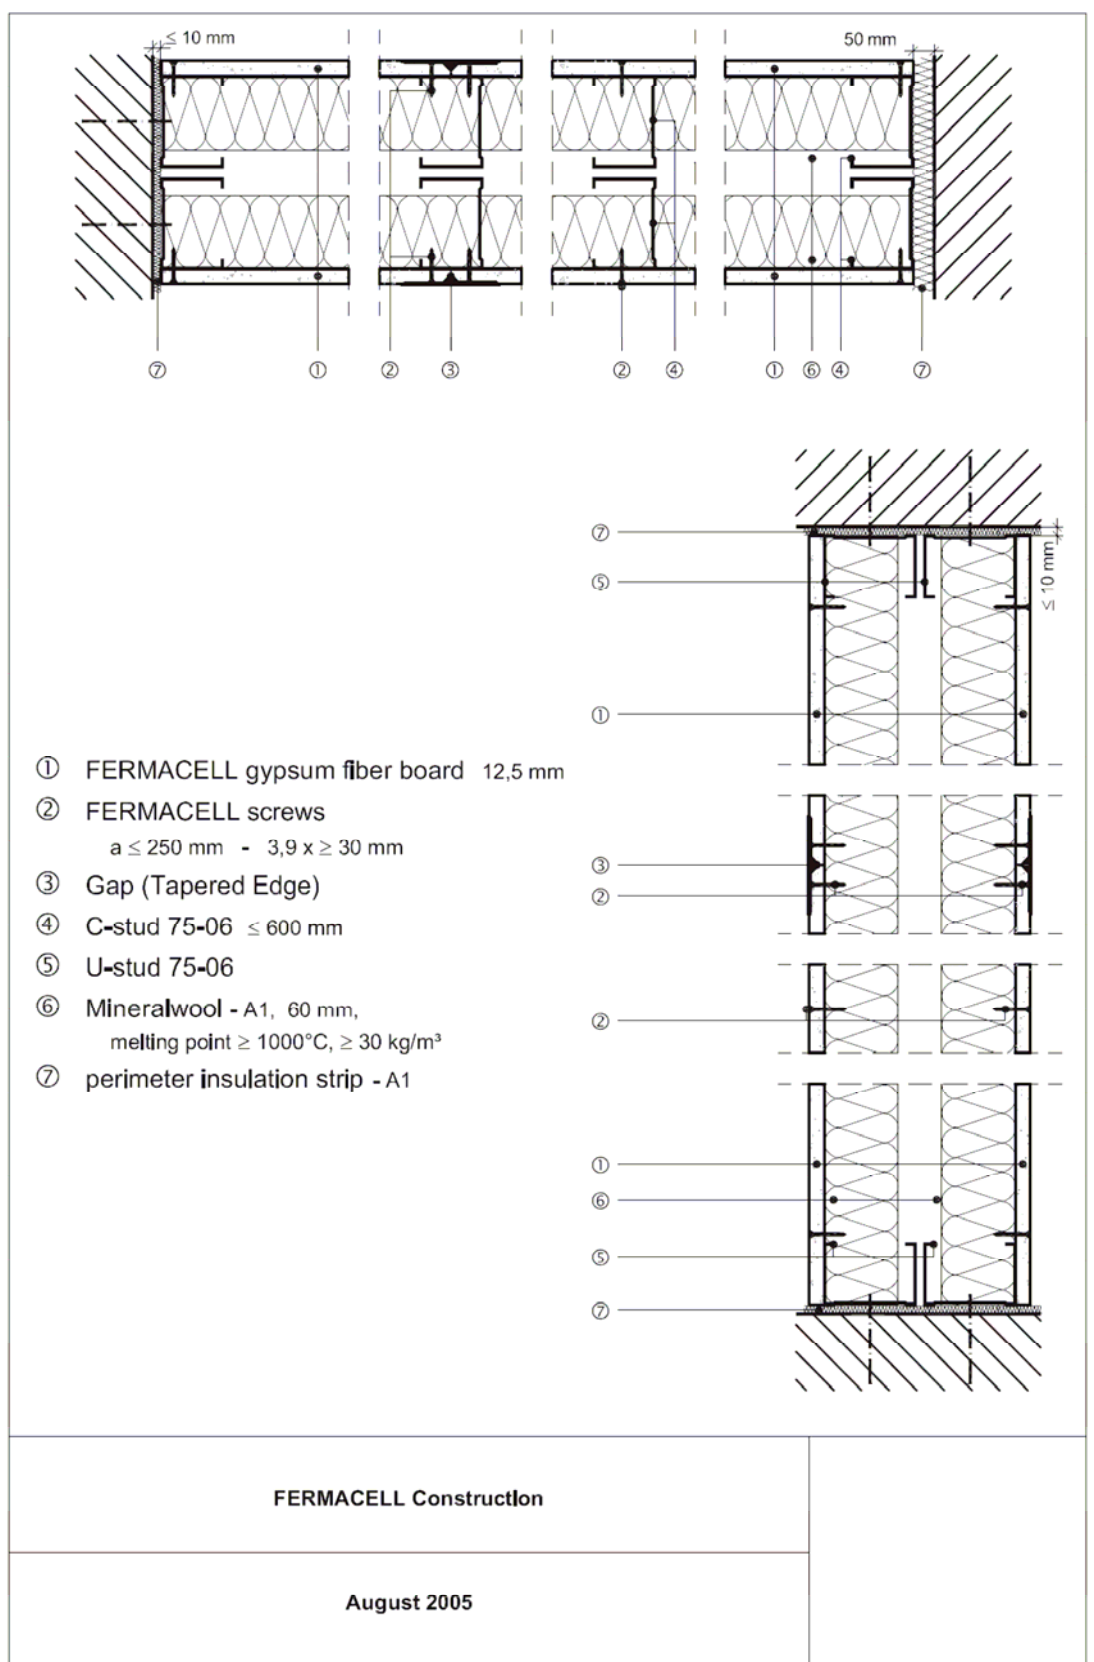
Cross-section overview of the 1S24 wall construction with 2 layers of mineral wool.
